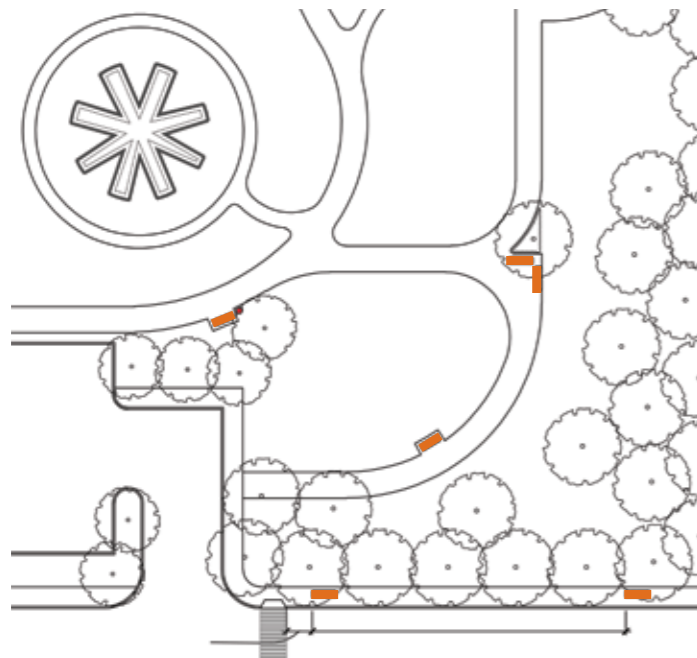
Park Layout (part plan) depicting bench locations.
